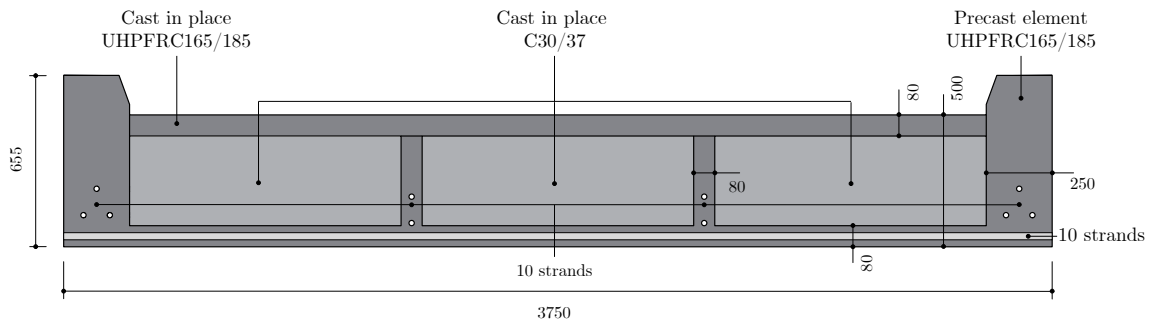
Feistritzbach bridge. Adapted from [34].
